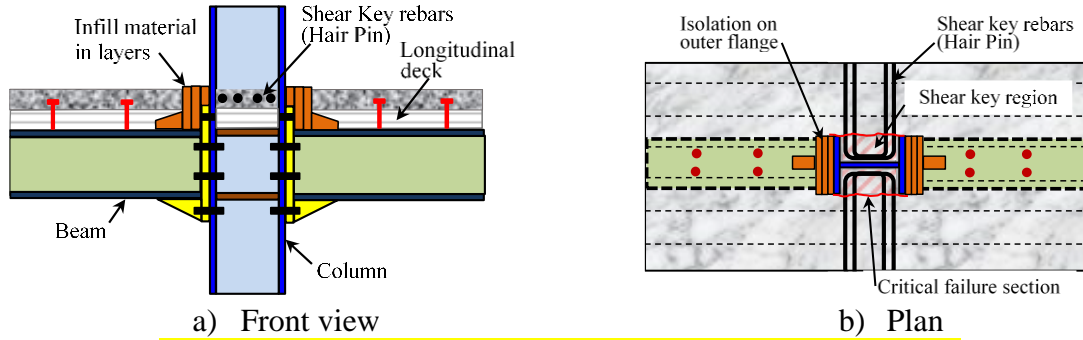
Shear Key Slab Unit (SK-SU) Test Sub-Assembly
